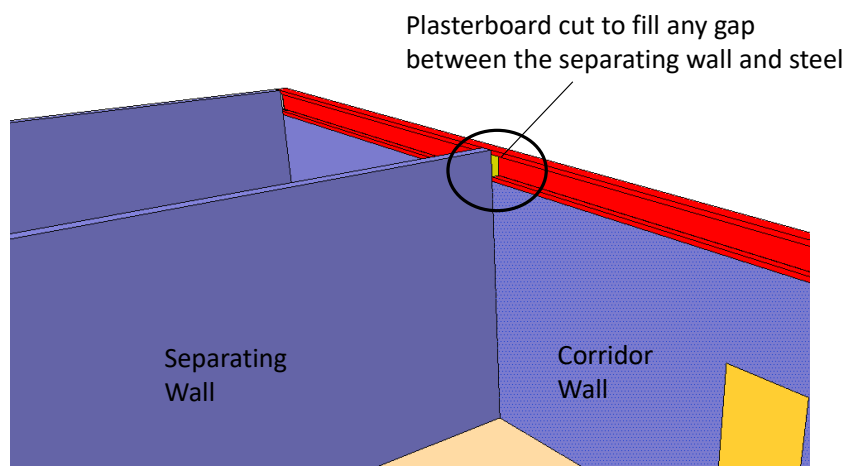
Steel flanking detail at corridor wall / separating wall junction
